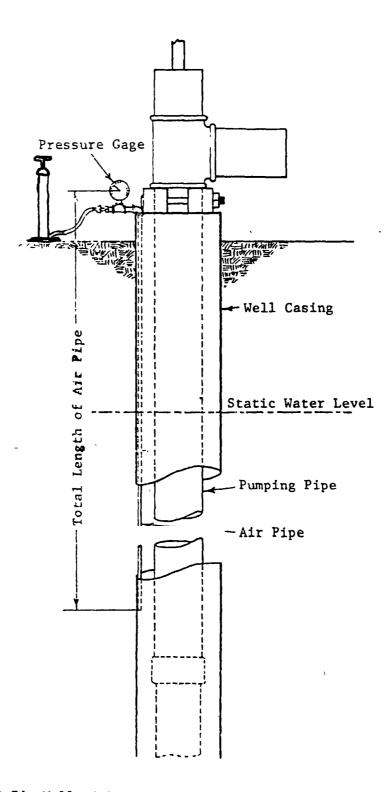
B-74 Well with air line installed to accurately determine the static level, pumping level, and drawdown.
